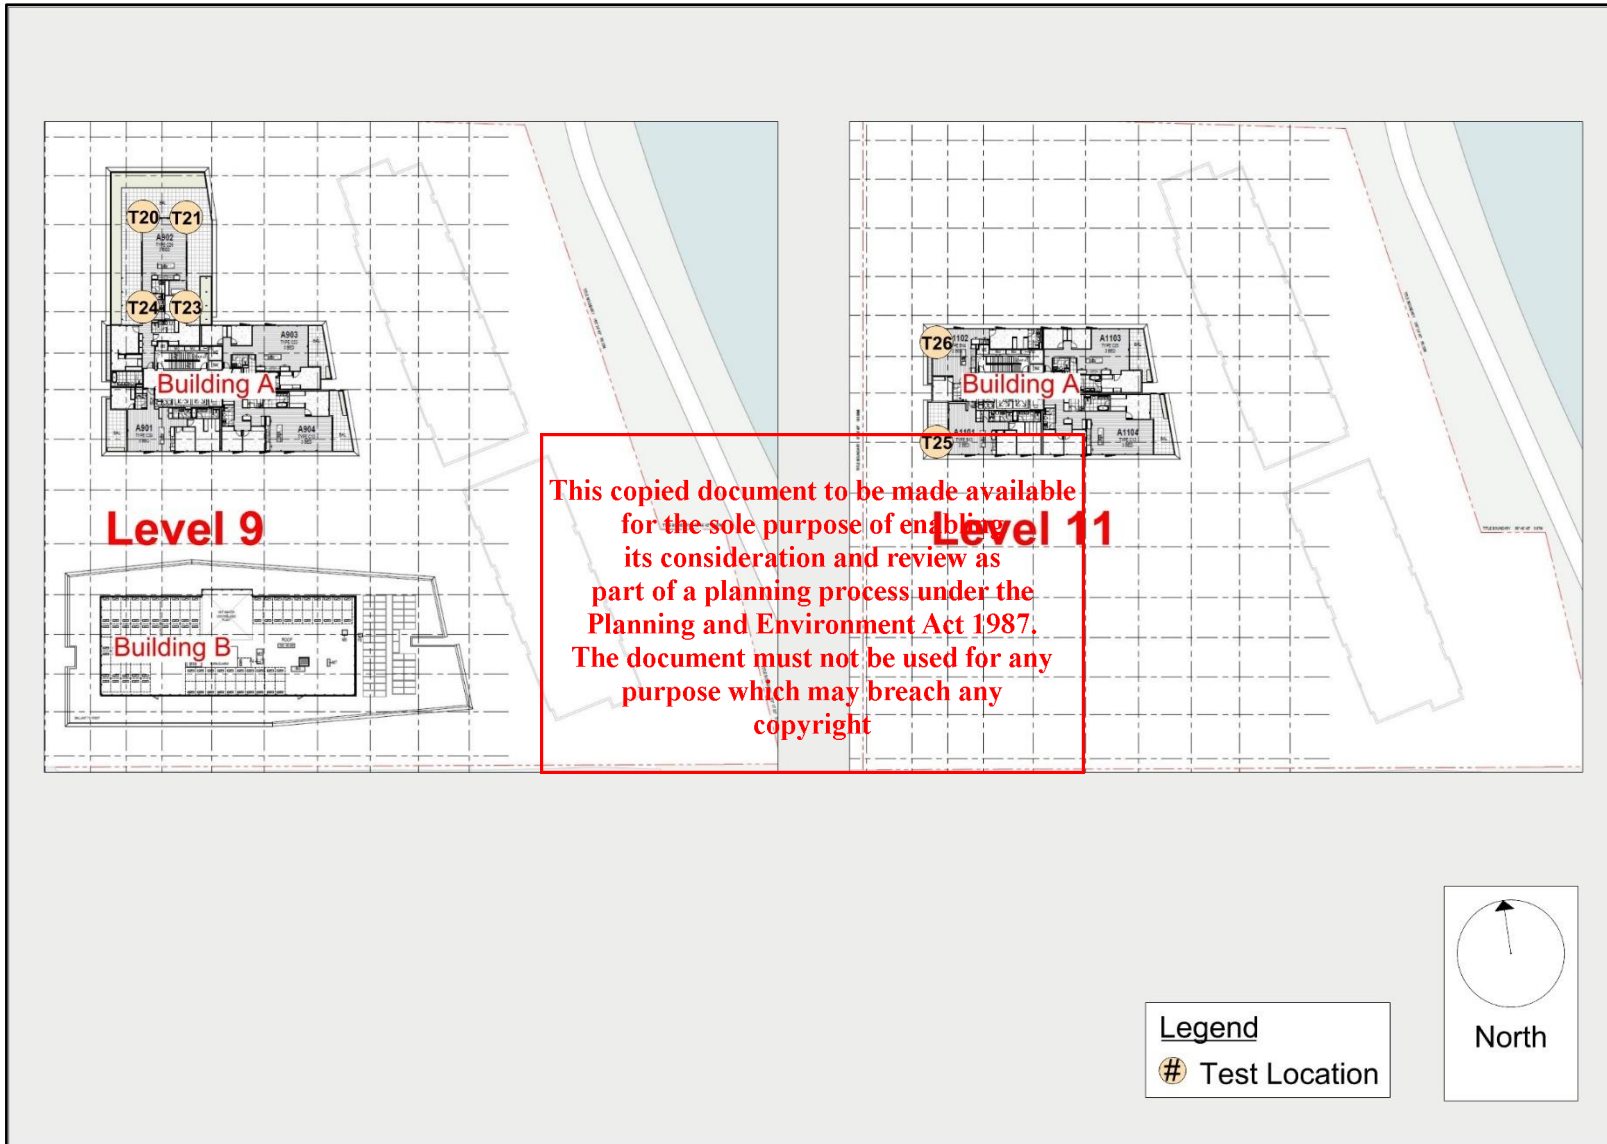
Level 9 and 10 Terraces Test Locations on the proposed 43 and 63-67 River Street development.
